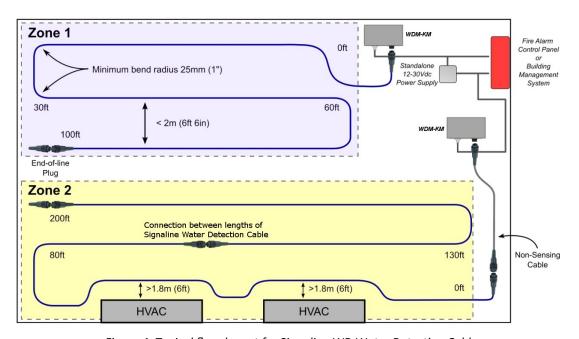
Typical floor layout for Signaline WD Water Detection Cable
